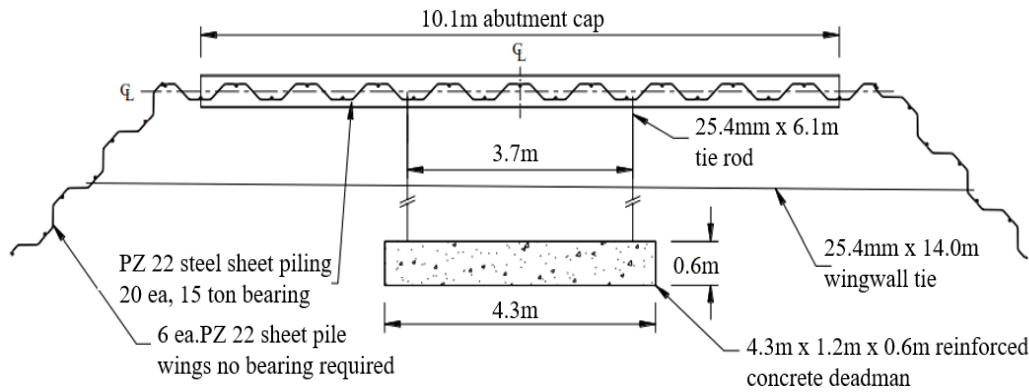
Plan view of the sheet pile abutment and retaining backfill system for a demonstration project in BHC, Iowa (from Evans et al., 2011).
